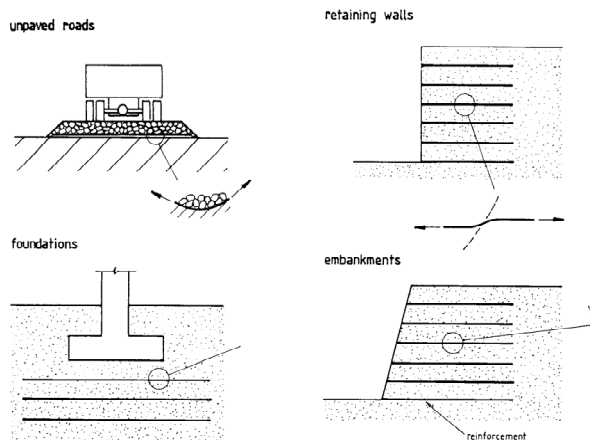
Typical examples of soil reinforcement application (Palmeira, 1987)
